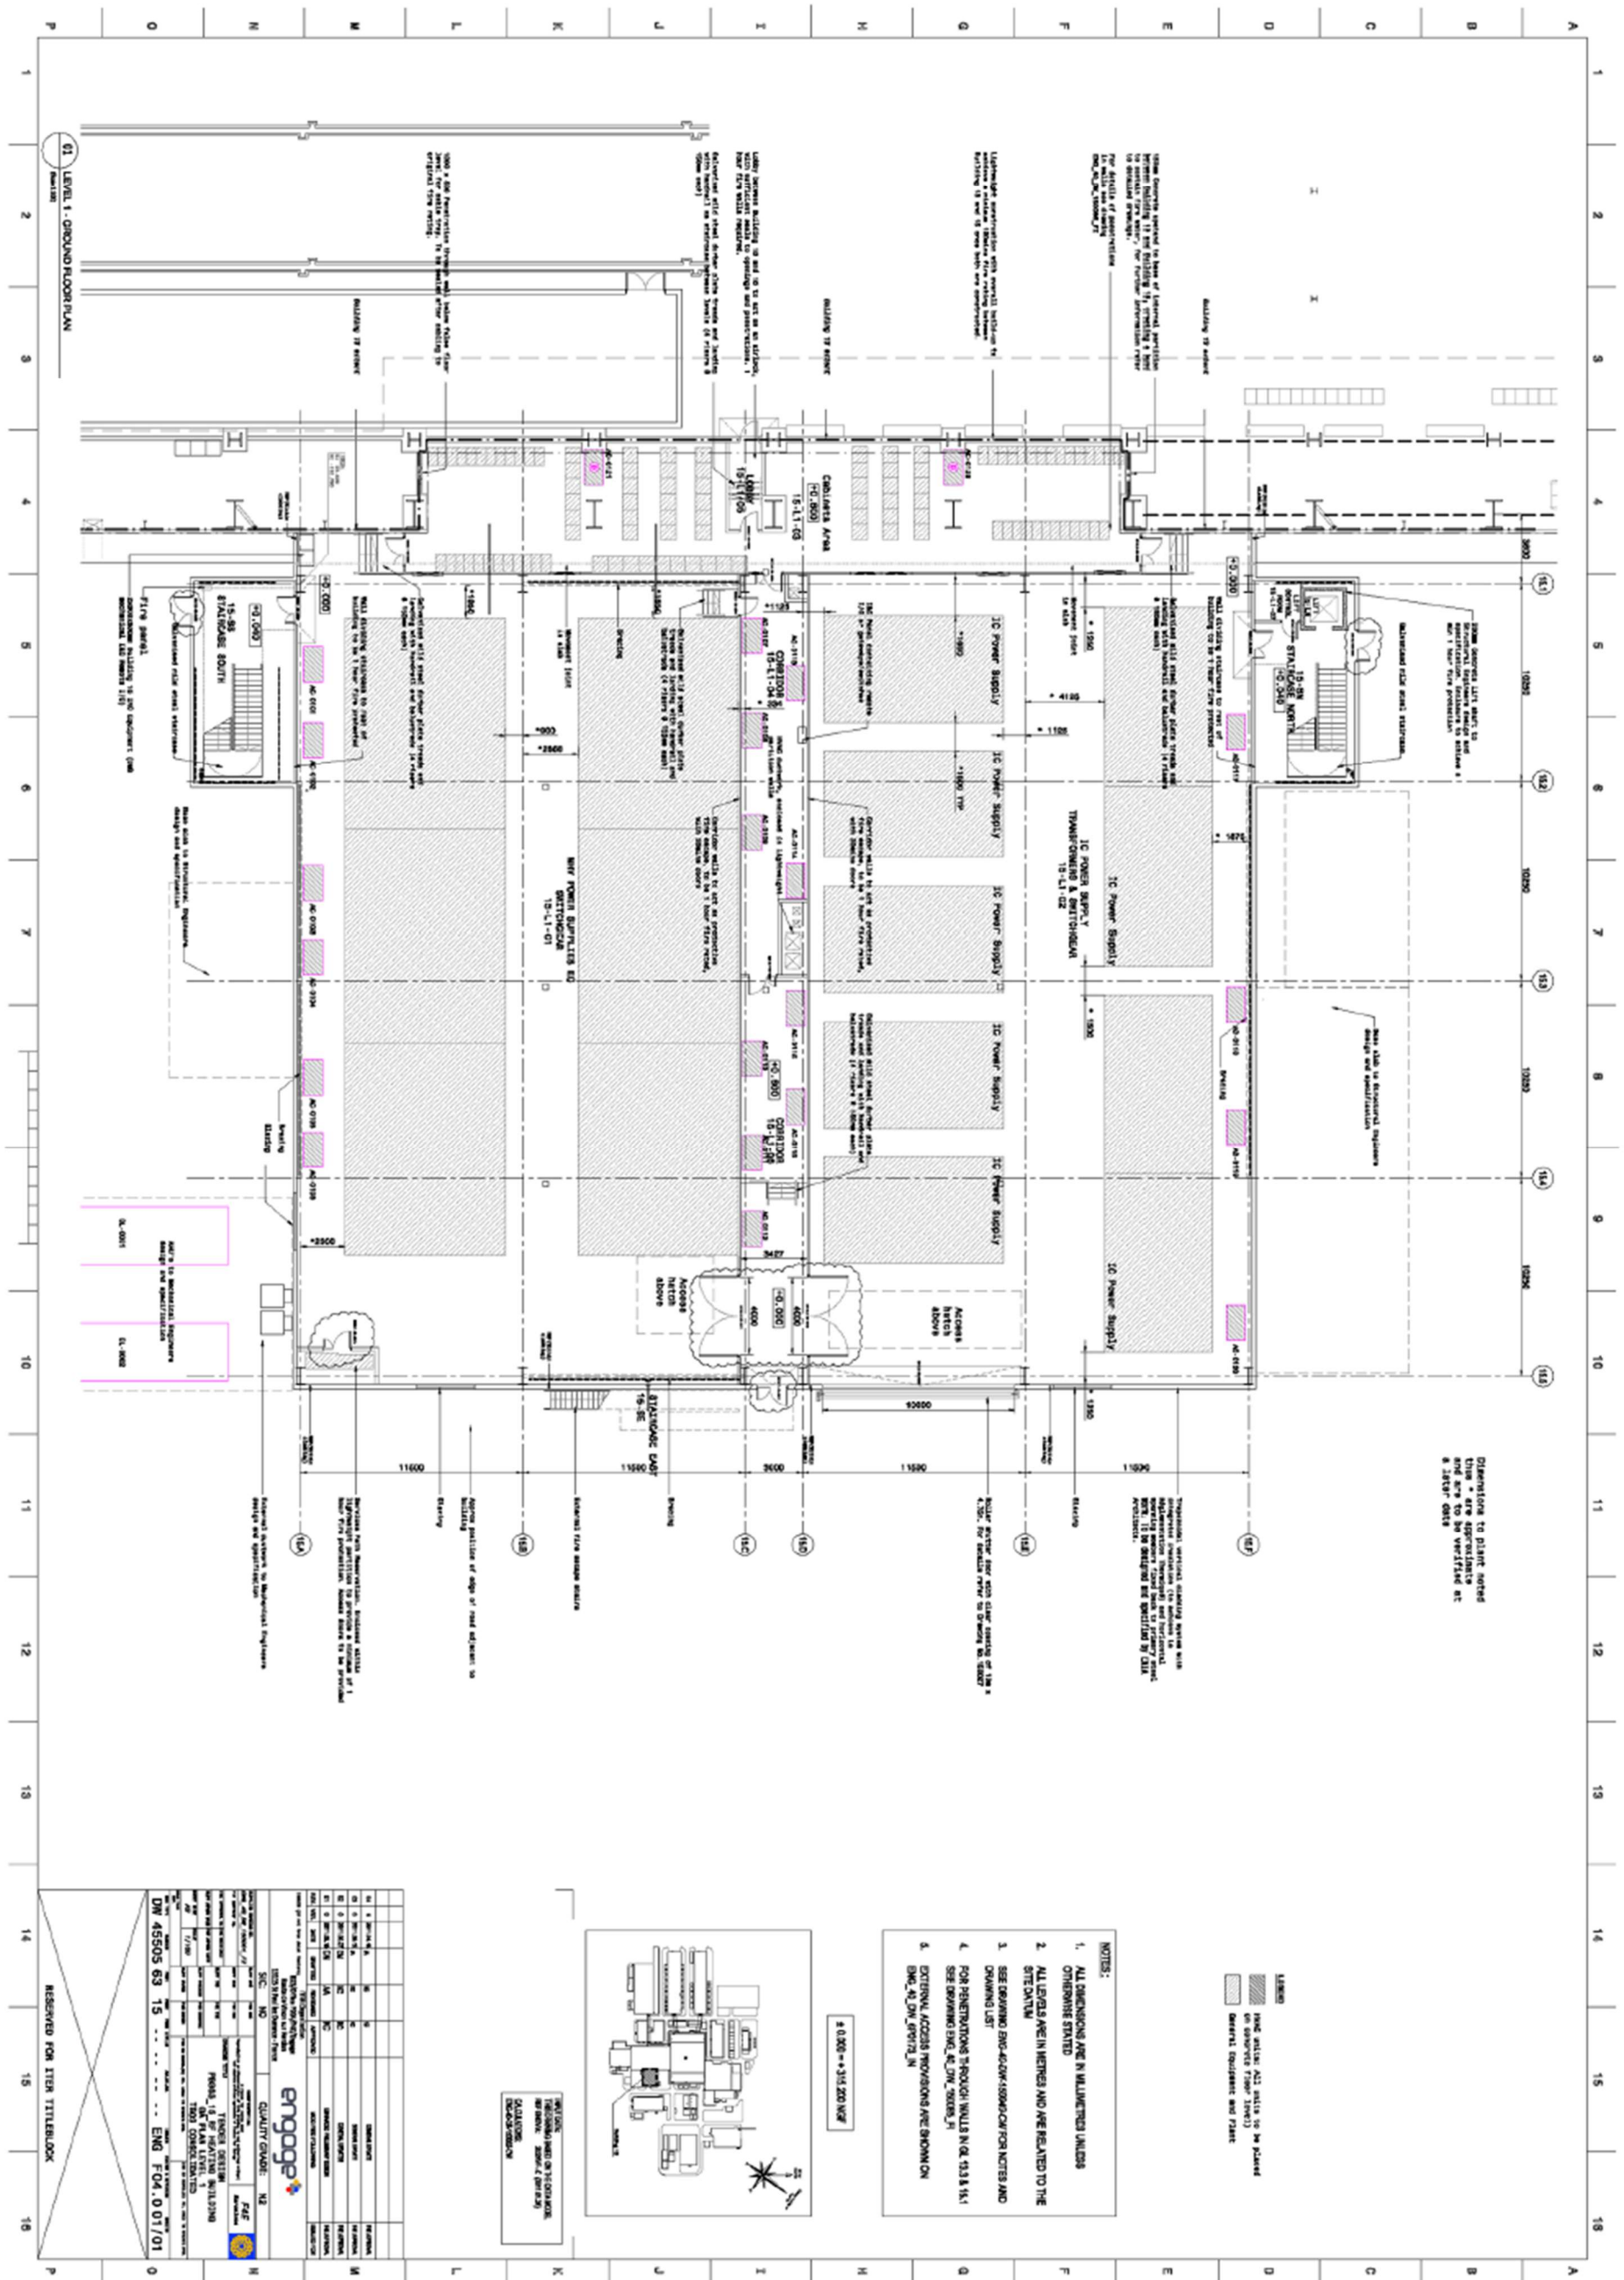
Building 15 Layout EC PS ground level (L1) showing main dimensions
